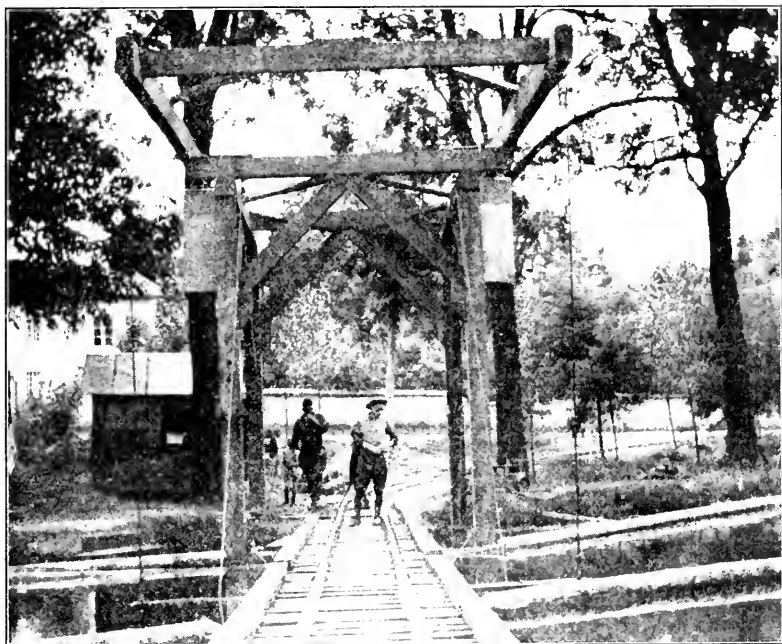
LIFT BRIDGE OVER CANAL AT VOIE (MEUSE).
